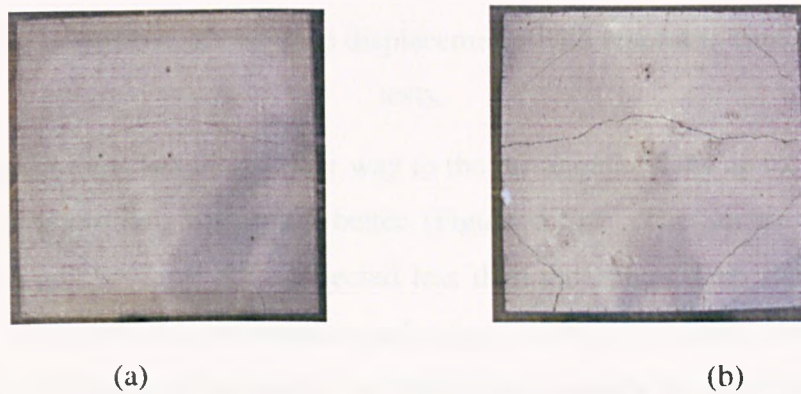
Test 9 (a) View of bottom surface of slab and (b) View of top surface of slab.
